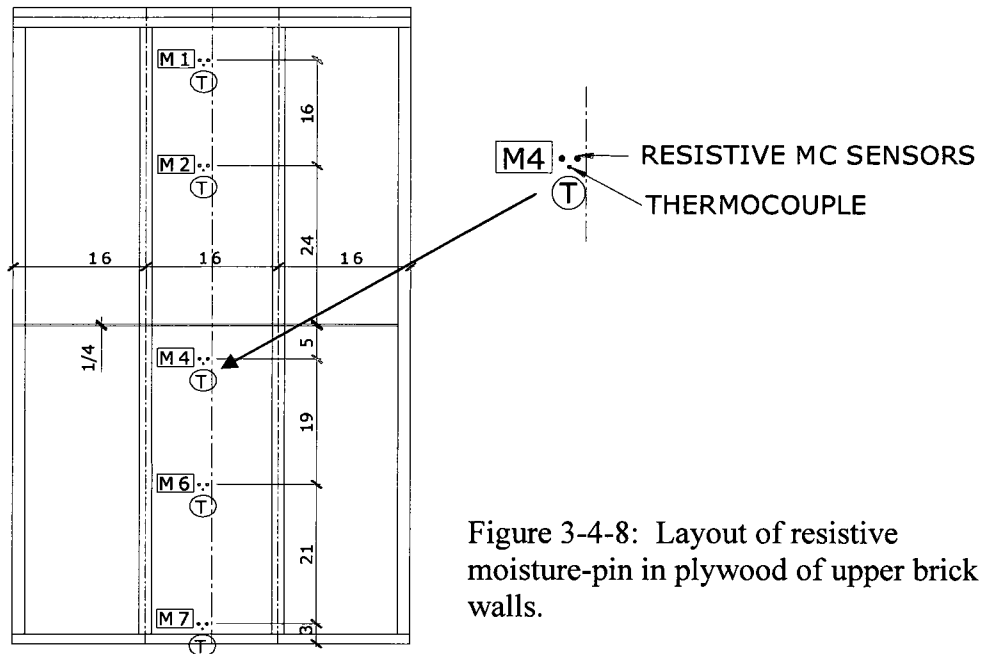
Layout of resistive moisture-pin in plywood of upper brick walls.
